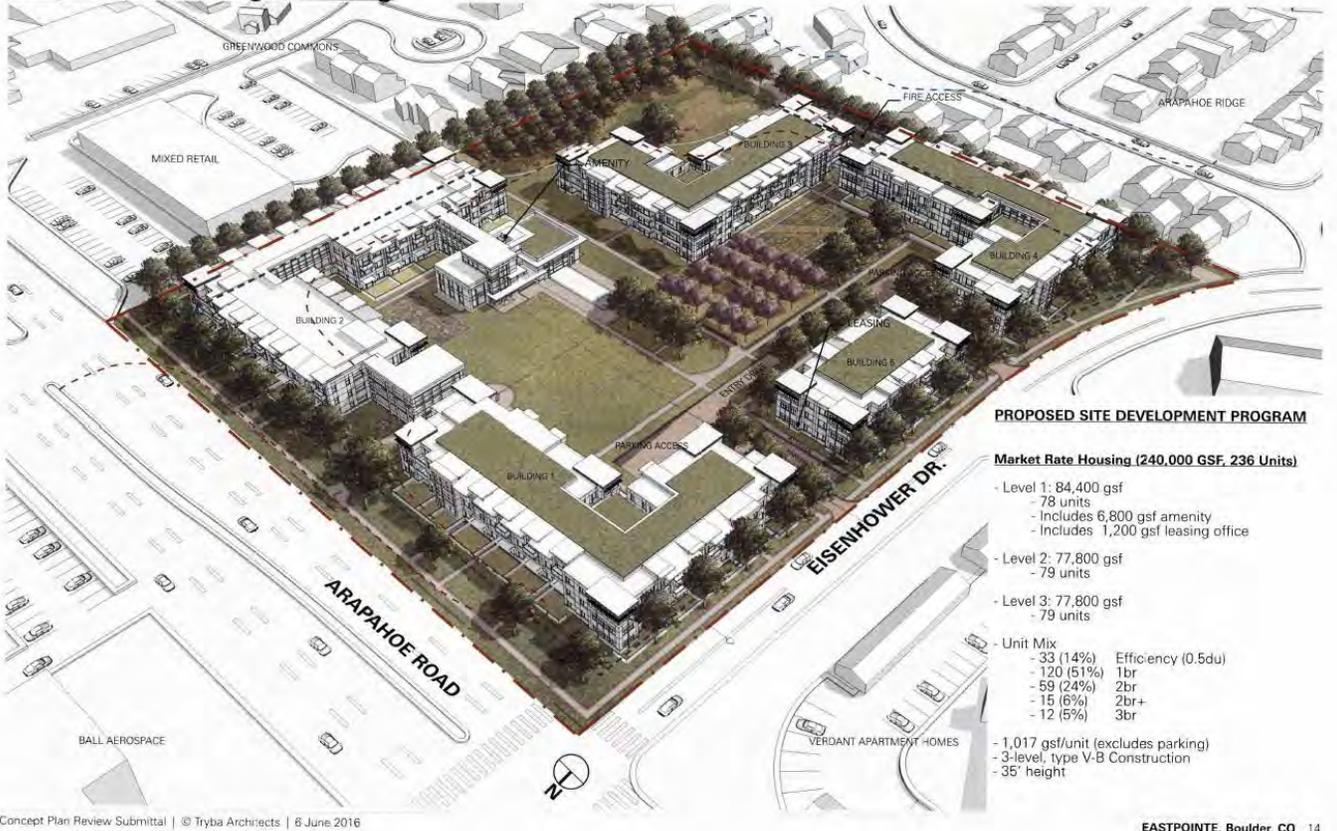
Birds Eye Perspective of Proposal looking Southeast
